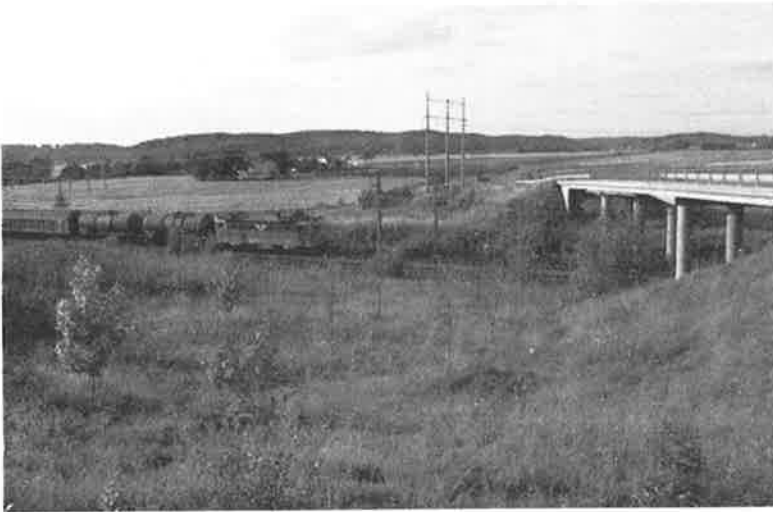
The road embankments and the double track railroad line at the Hanhals test site seen from a southerly perspective.
